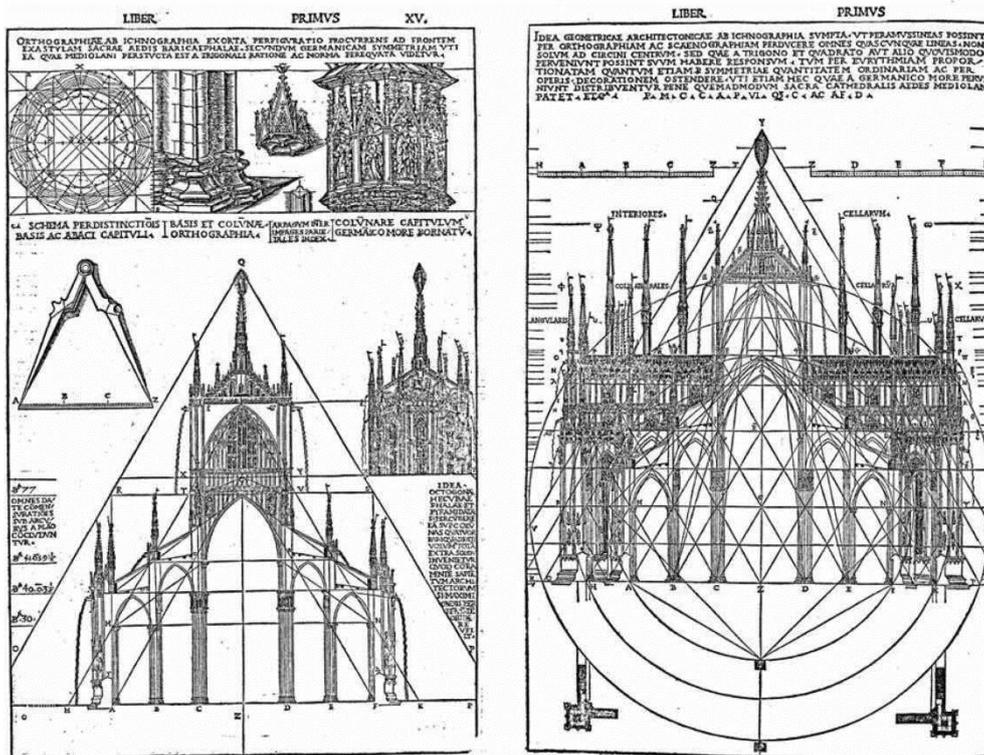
Cathedral of Milan, layout of the section by Cesare Cesariano (Vitruvio, 1521)
